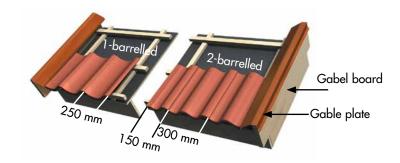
Calculate the roofs width in tiles. Note that the last tile, closest to the gable, should have a width of 300 mm.
